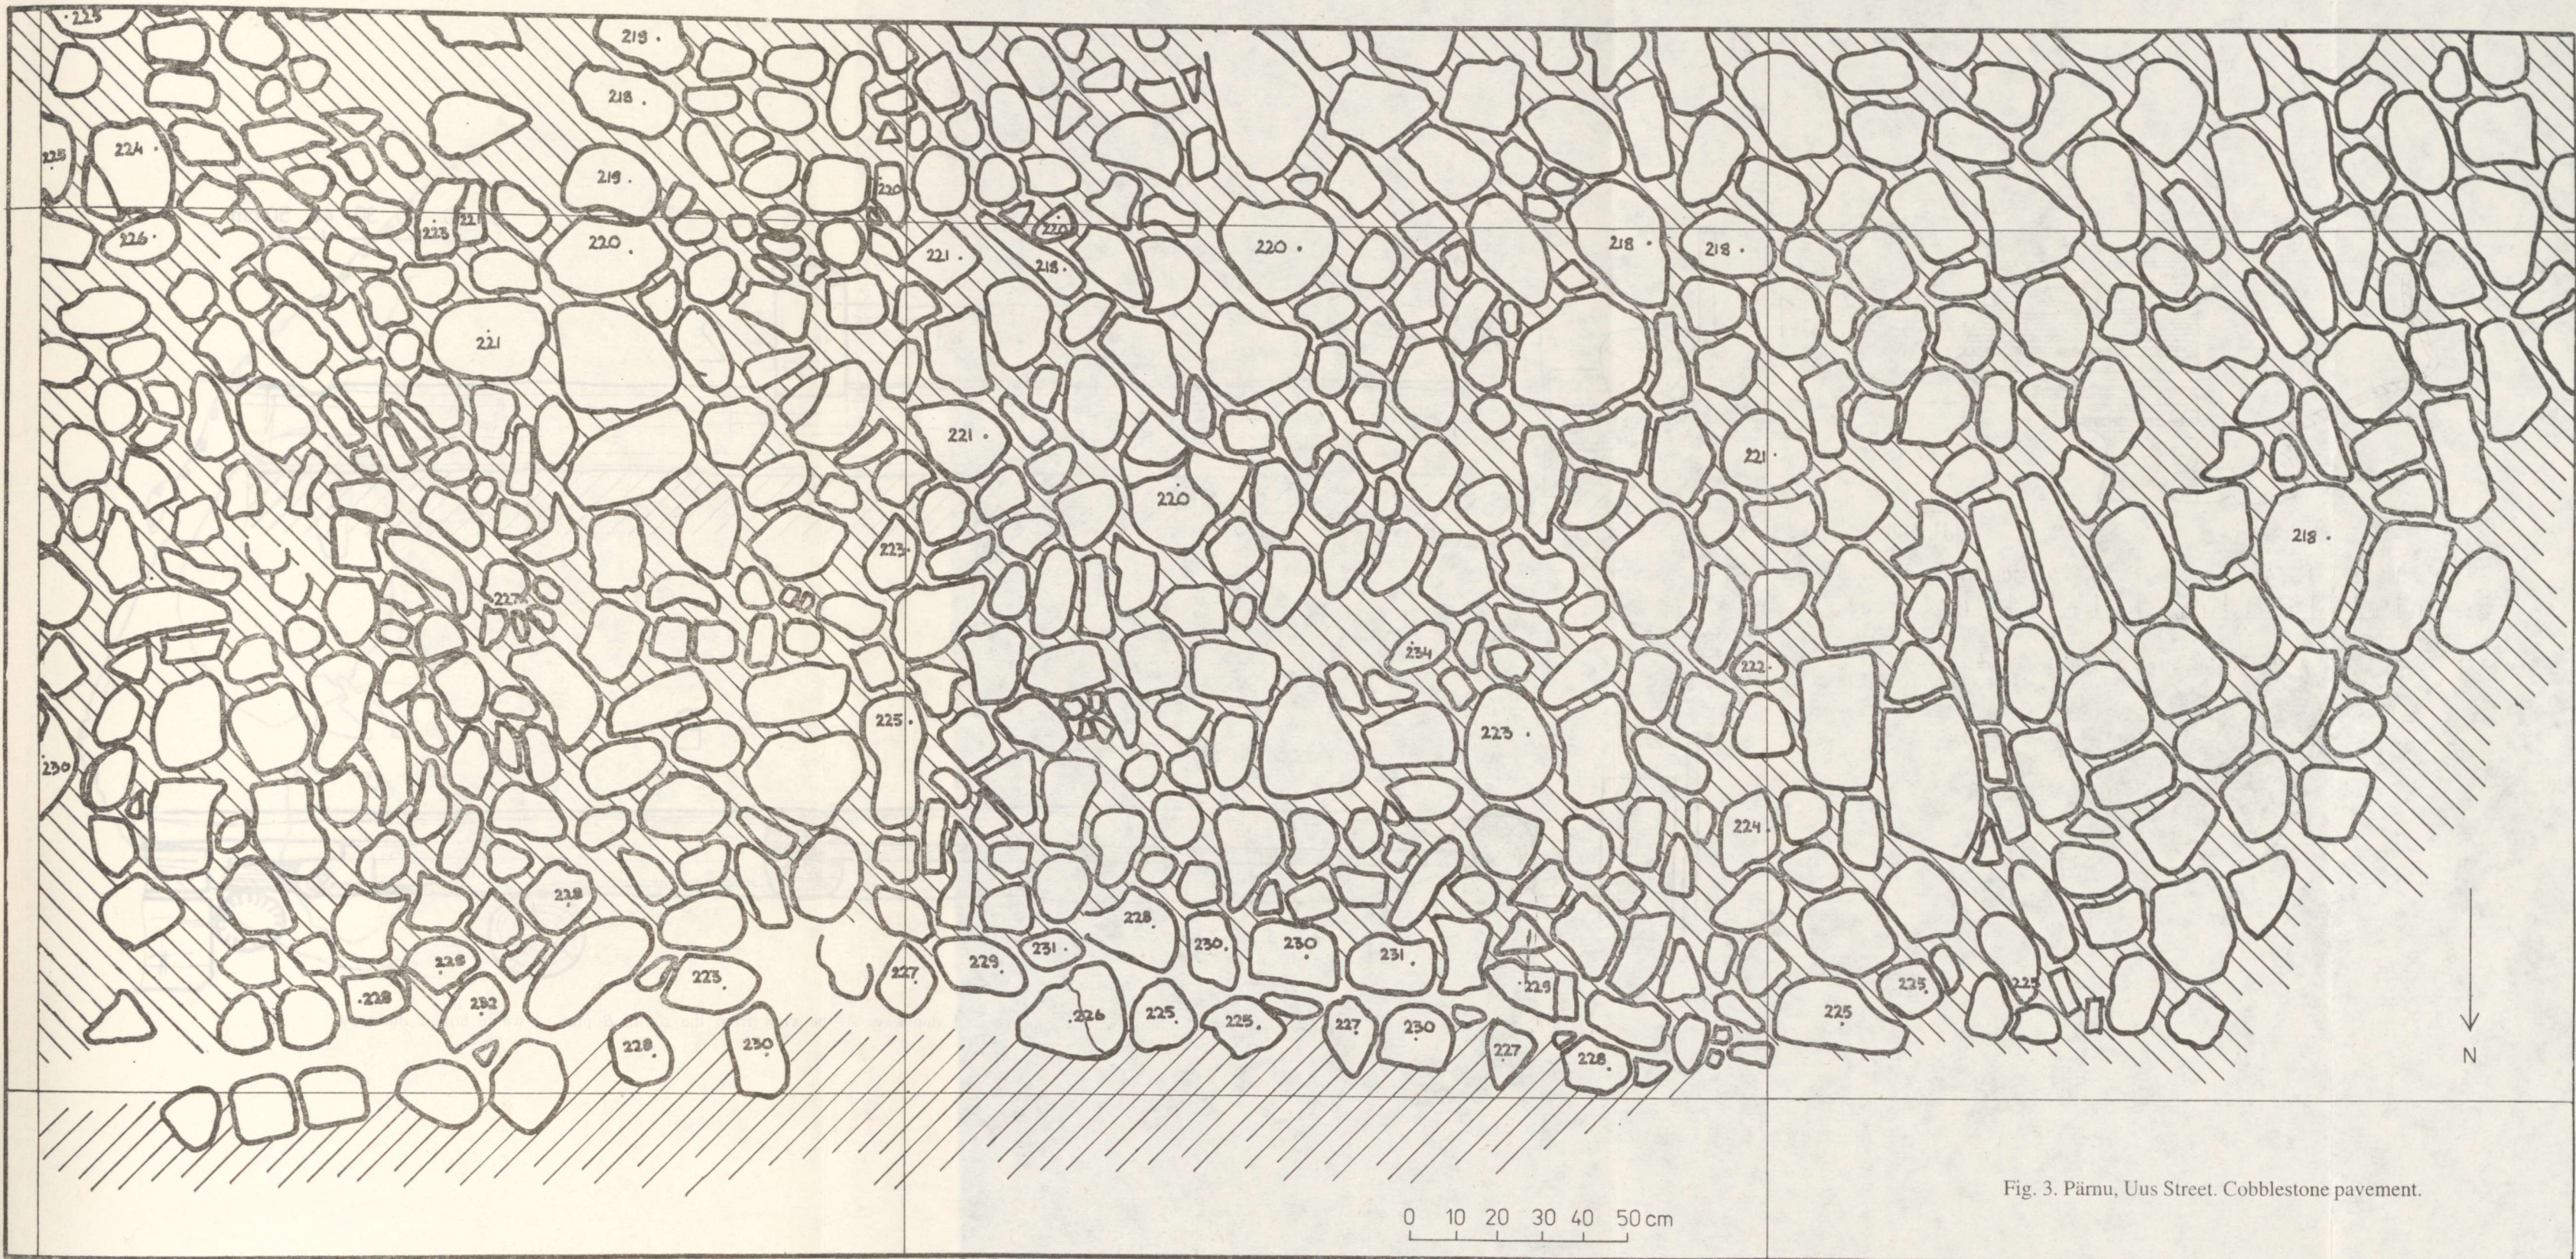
Pärnu, Uus Street. Cobblestone pavement.
